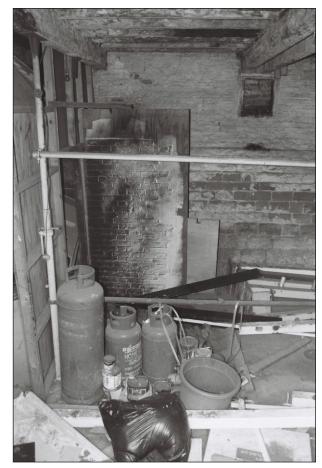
General view of G19 showing wall box, looking west (Film 2.16)
